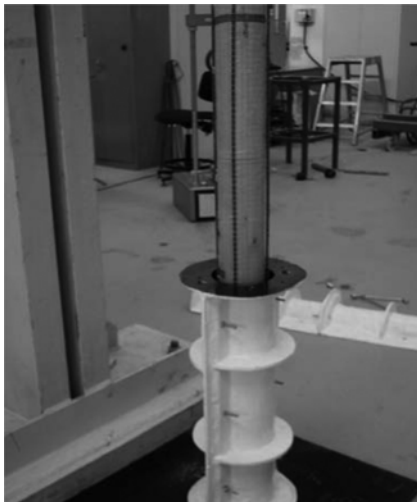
Inner and outer moulds with wire mesh and steel bars installed
